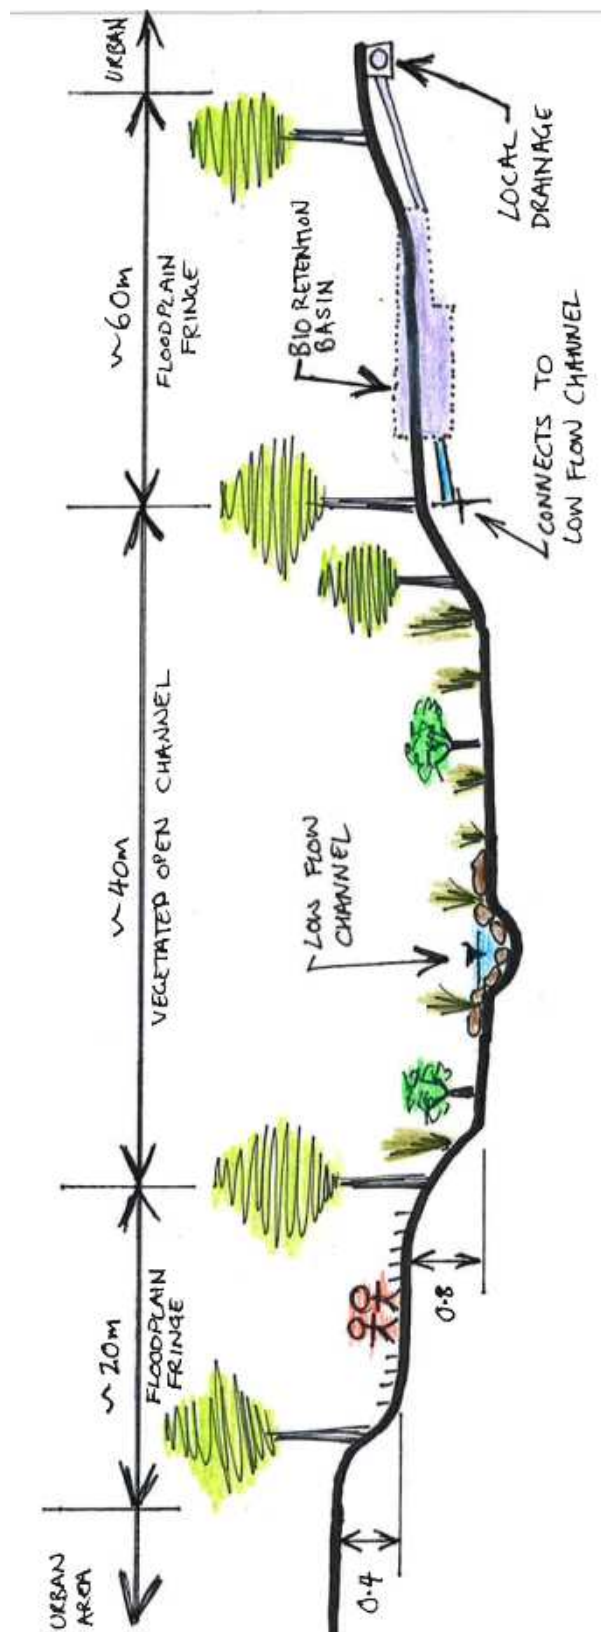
Concept Geometry of Floodway between Denham Court Road and Camden Valley Way
